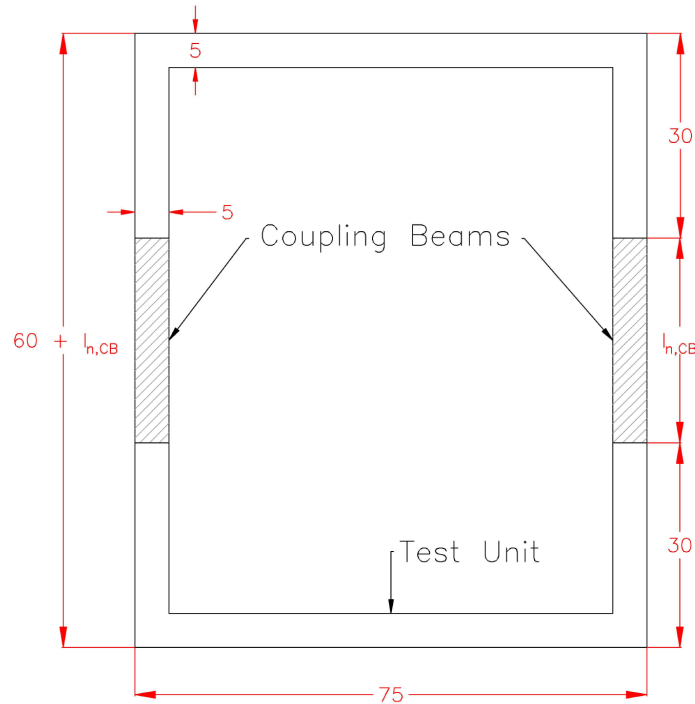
Assumed core wall system and the selected test specimen dimensions (Dimensions are in inches)
